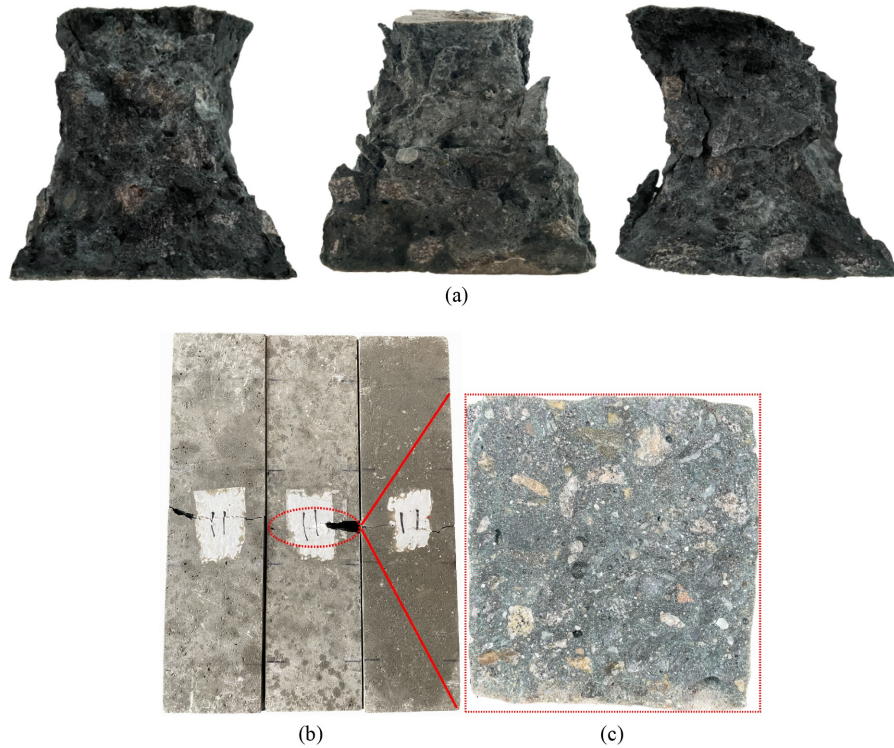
The failure pattern of TGC specimen. (a) Compression test; (b) flexural tensile test: breaking crack; (c) breaking section.
